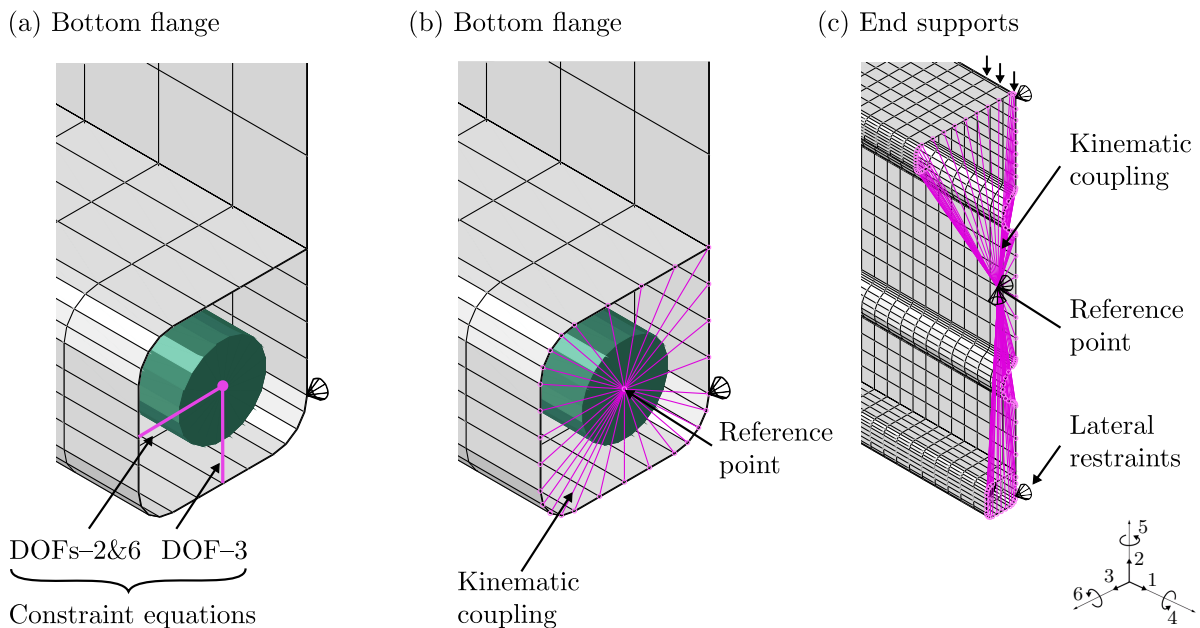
Modelling of the (a) beam–cable connection at every cross-section along the member, (b) anchorages at the two beam ends and (c) simply-supported boundary conditions.
